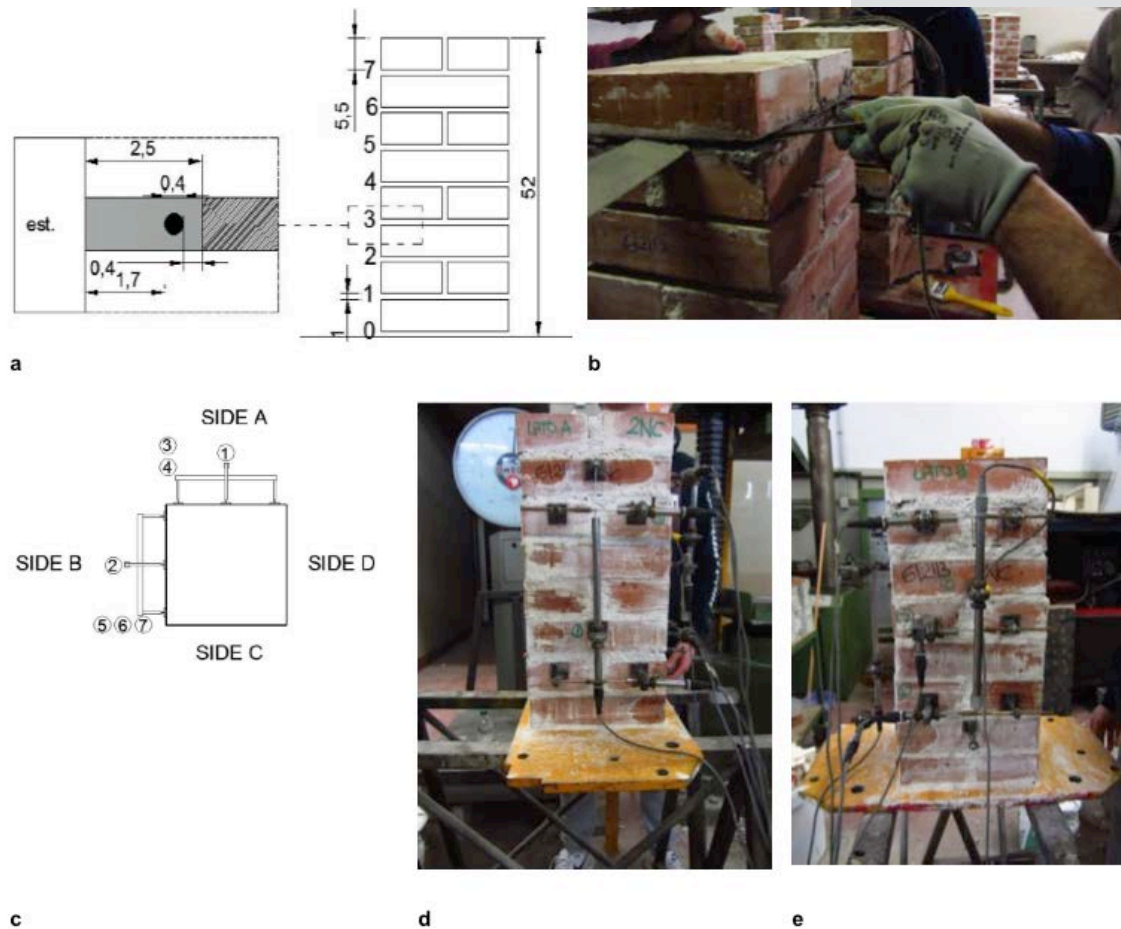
Consolidation of masonry specimens: design (a) and execution (b). Location of displacement transducers: plan view (c) and front views (d – e).
